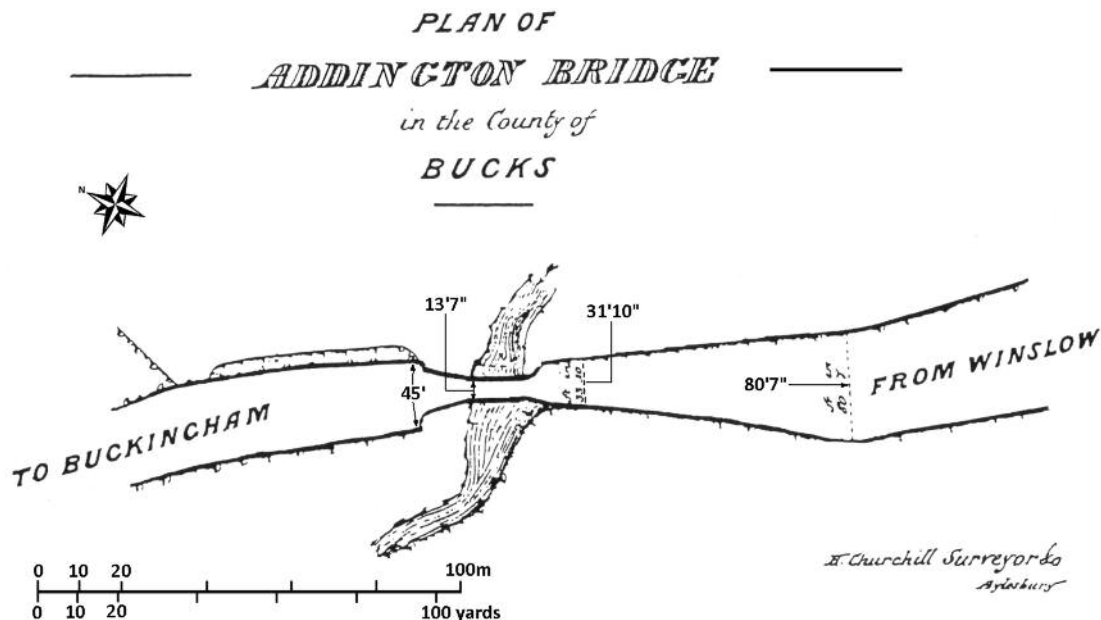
Plan of Addington Bridge. H. Churchill, 1843 (CBS T3/32/1)
